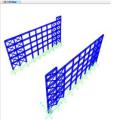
Modelling of steel bracing in direction YZ at X= 0, 36.5
